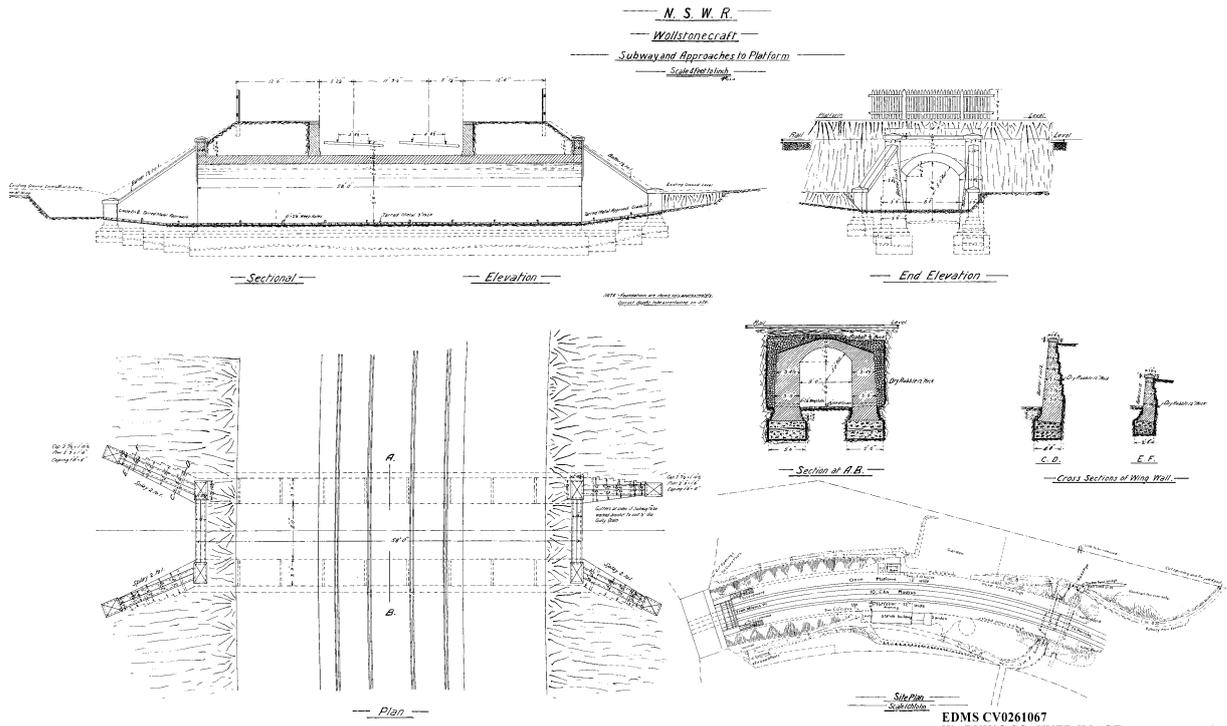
Plan of Subway and Approaches to Platform, 1910. (Source: Transport for NSW)
